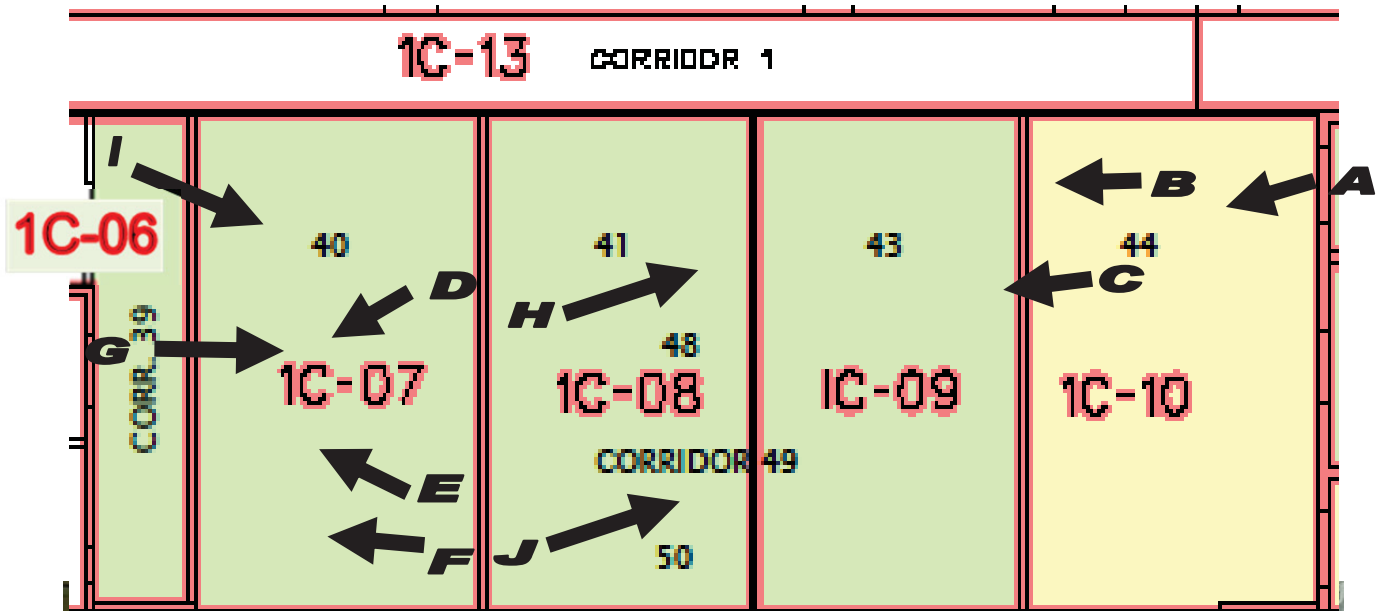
T Bldg. Rooms 39-44, 48-50 View A
